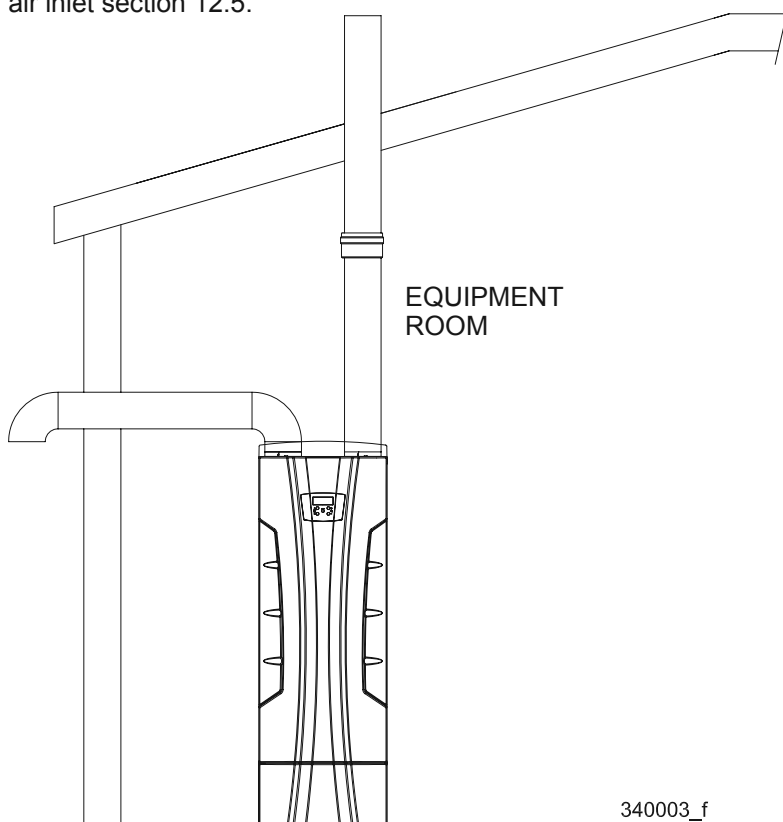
Vertical vent/air installation with sidewall combustion air inlet
